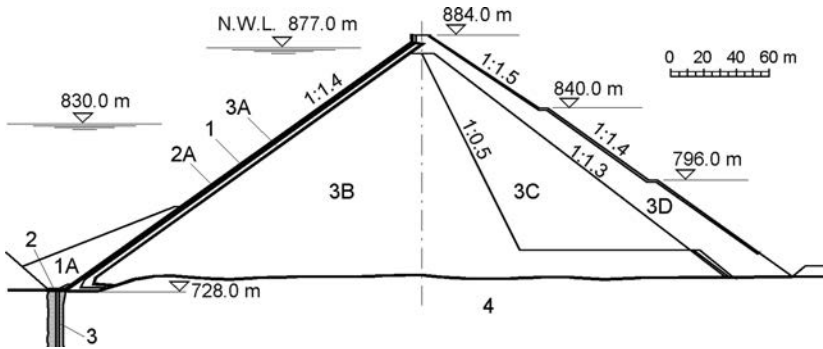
Typical cross-section of Zipingpu dam (after Zeping, 2009). (1) Concrete slab; (2) plinth; (3) grout curtain; (4) rock foundation; (1A, 2A, 3A, 3B, 3C, 3D) different zones of the rockfill dam (for details of the different zones of the concrete faced rockfill dams see Chapter 12).
